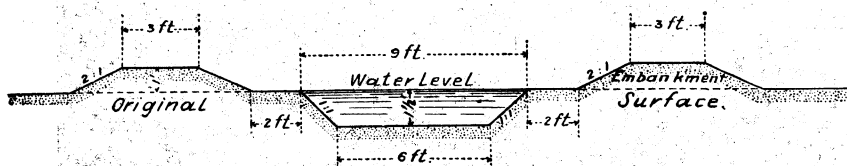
Farm ditch No. 5 with trapezoidal cross section
